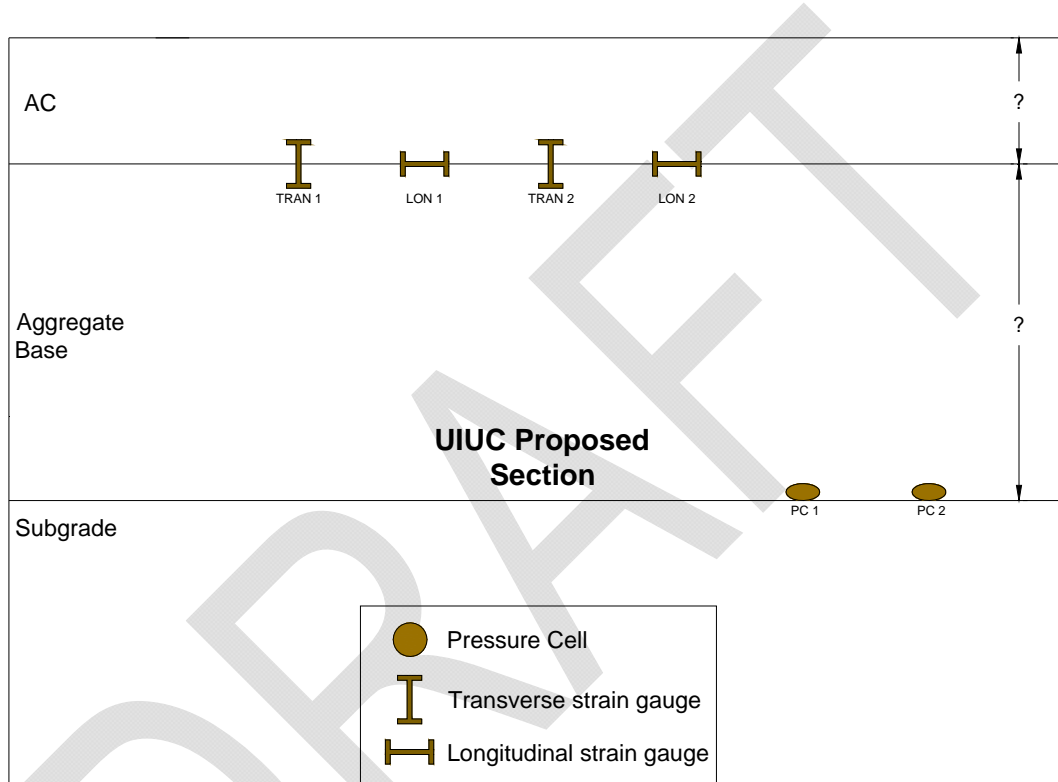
Plan and profile view of possible pavement structure and instrumentation of proposed section at UIUC
